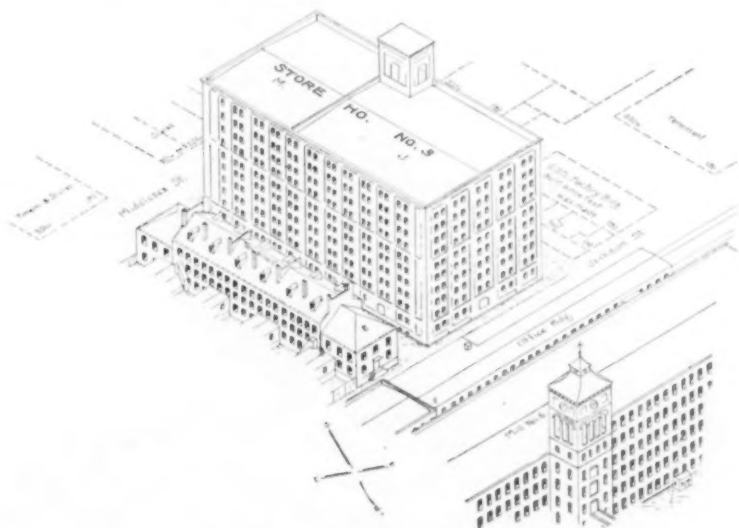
STORE HOUSE NO. 3, HAMILTON MFG. CO., LOWELL, MASS
